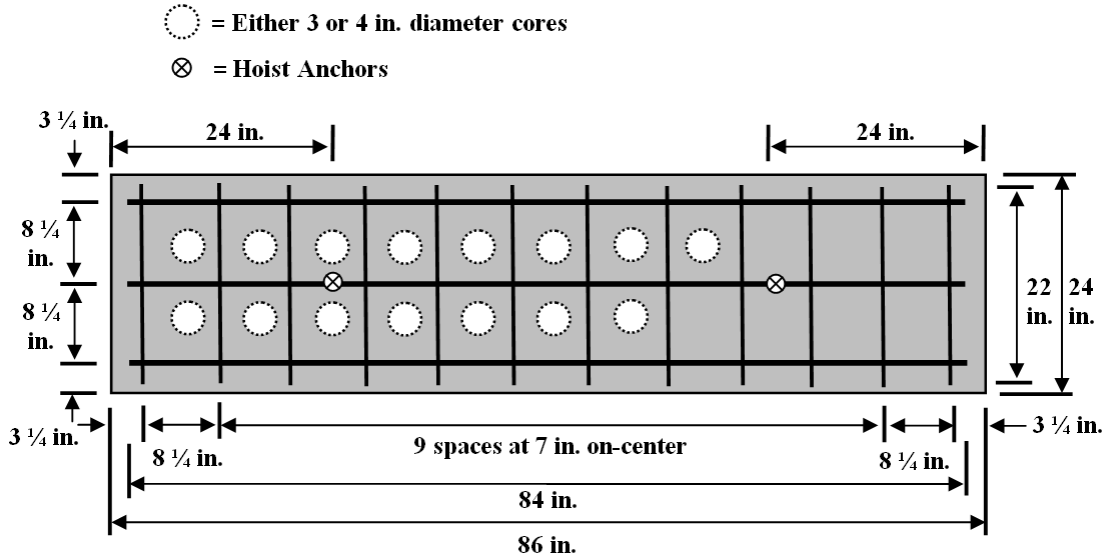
Steel reinforcement layout for slabs (plan view)
